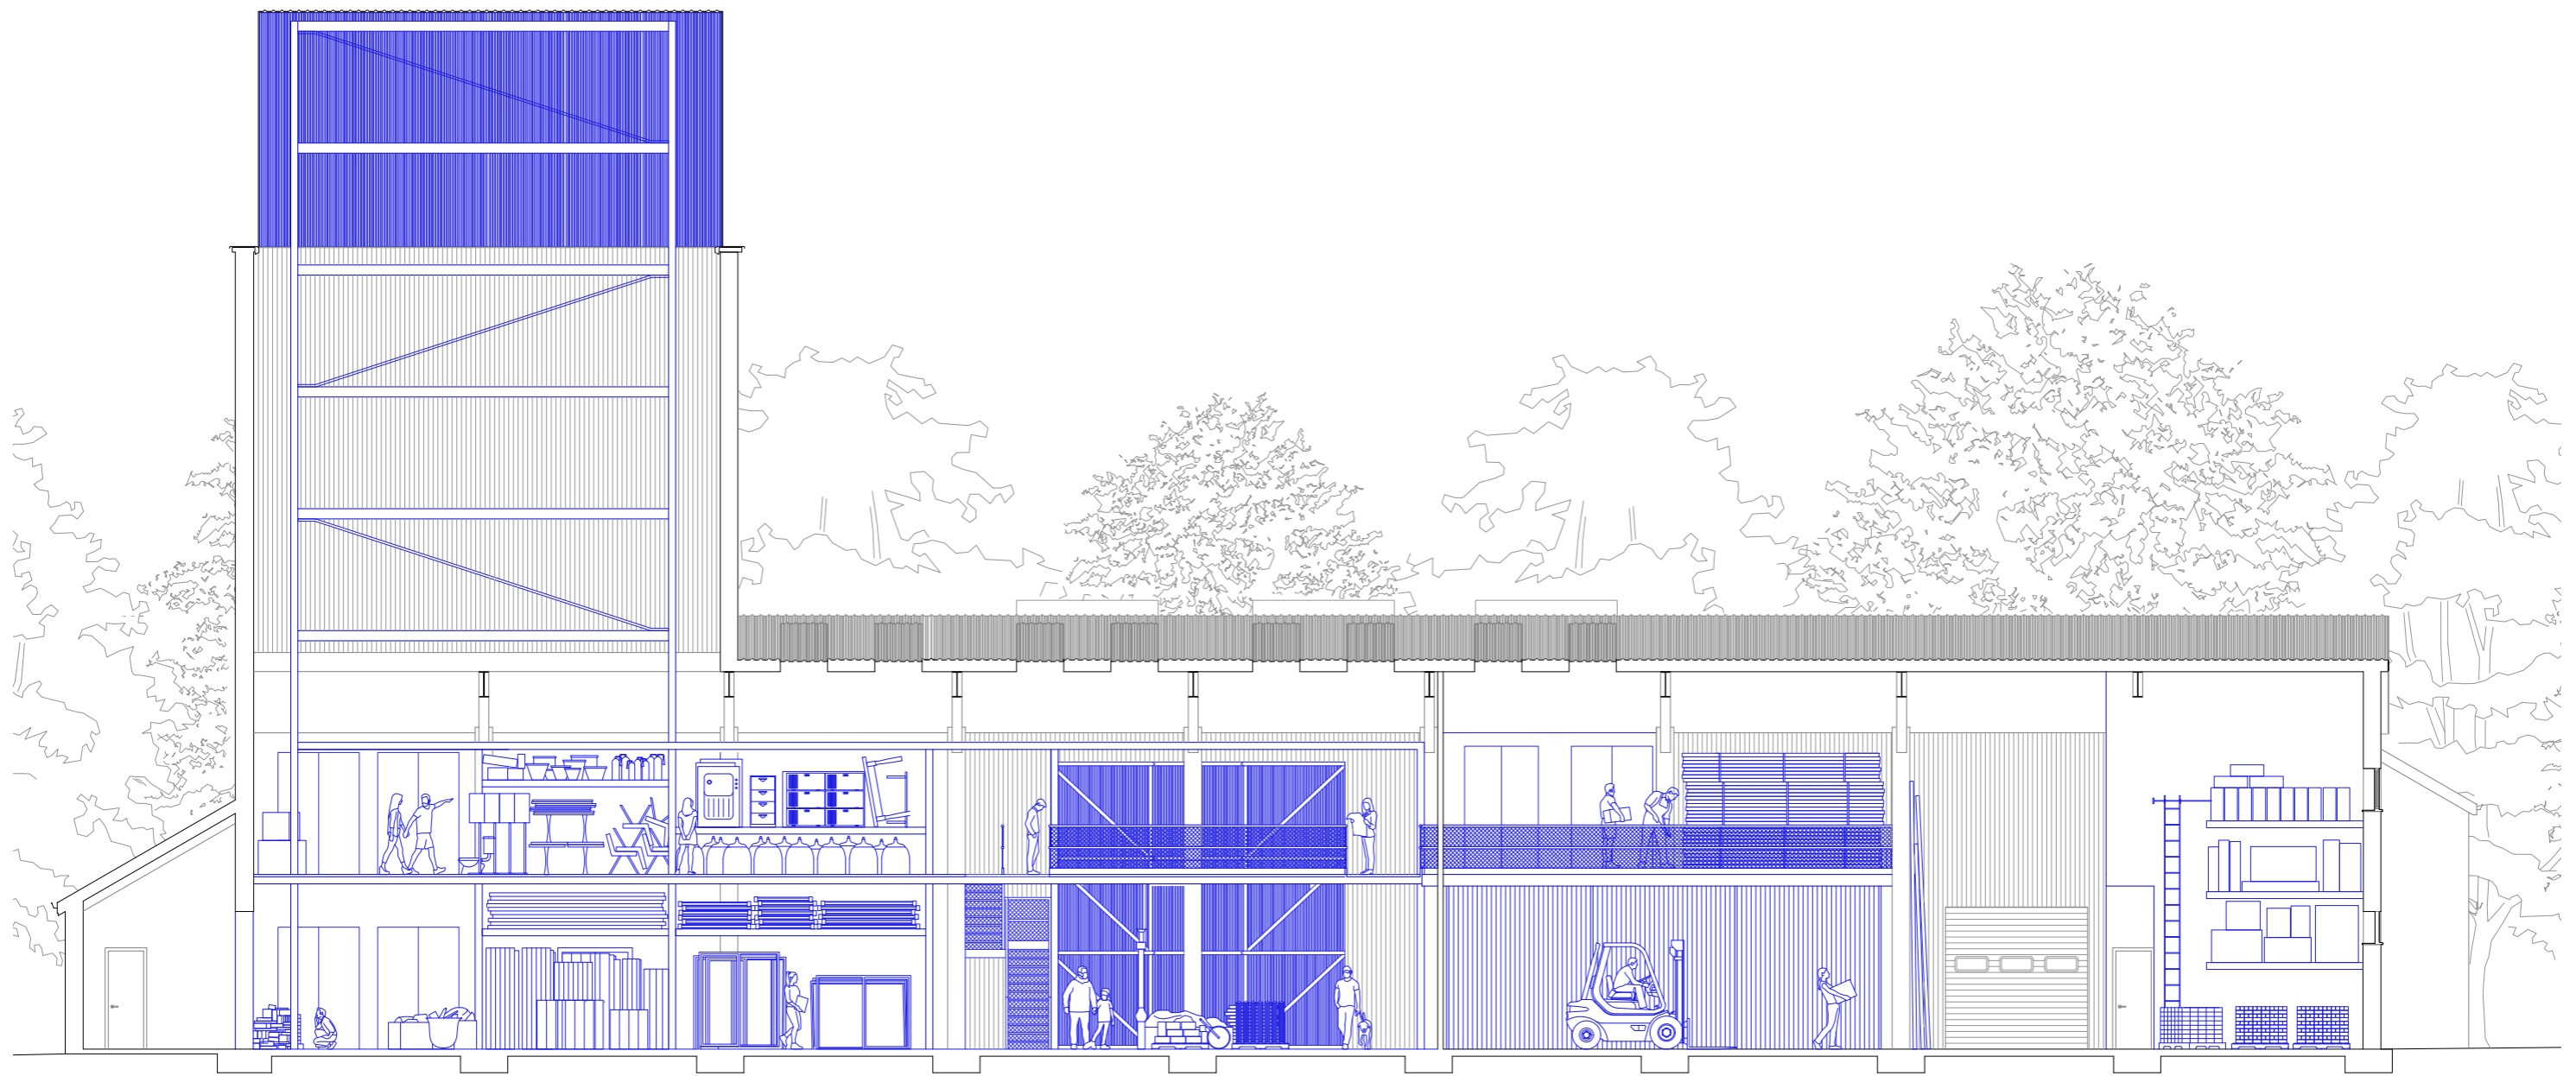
; Stage 3_ Part 1 Groupwork 'Reclamation Realm', Existing warehouse building with new structure within.
